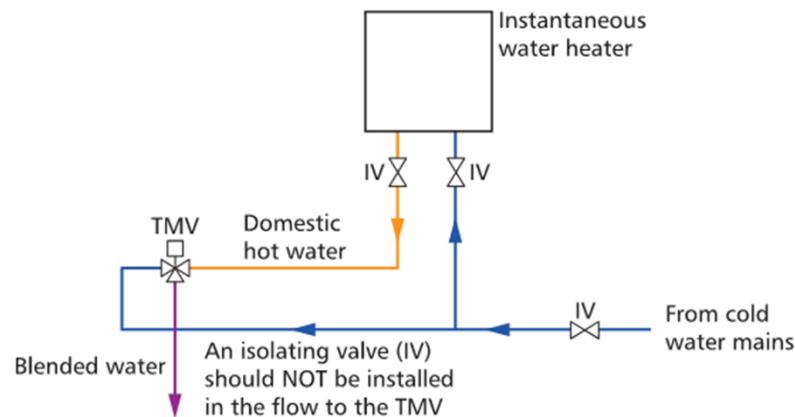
Pipework arrangement to prevent hot water bypass in event of cold water failure
